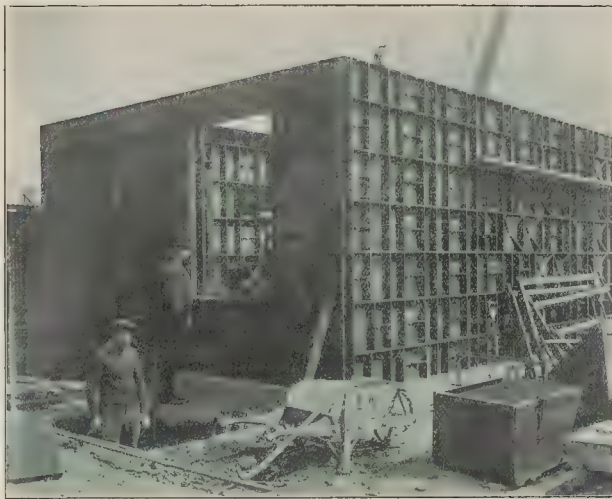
Poured Concrete House, Paris: Mould erected to First Floor Level.
